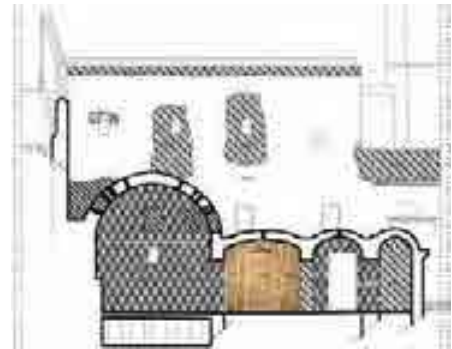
The Janissary bath: stratigraphy of masonry units in section AA (Author, 2008).
